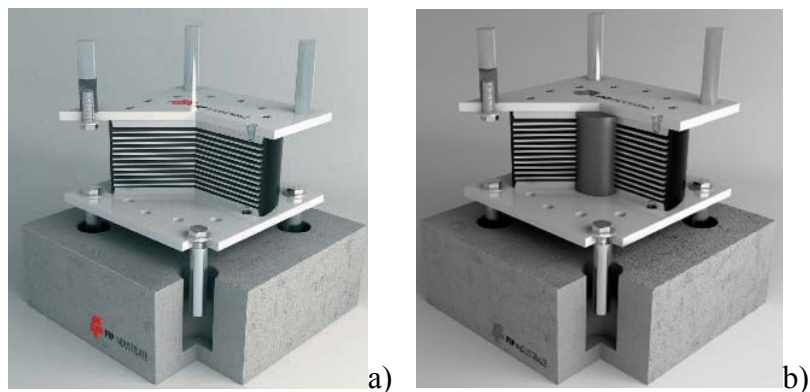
Elastomeric bearing: a) Low damping rubber bearing, b) Lead rubber bearing
